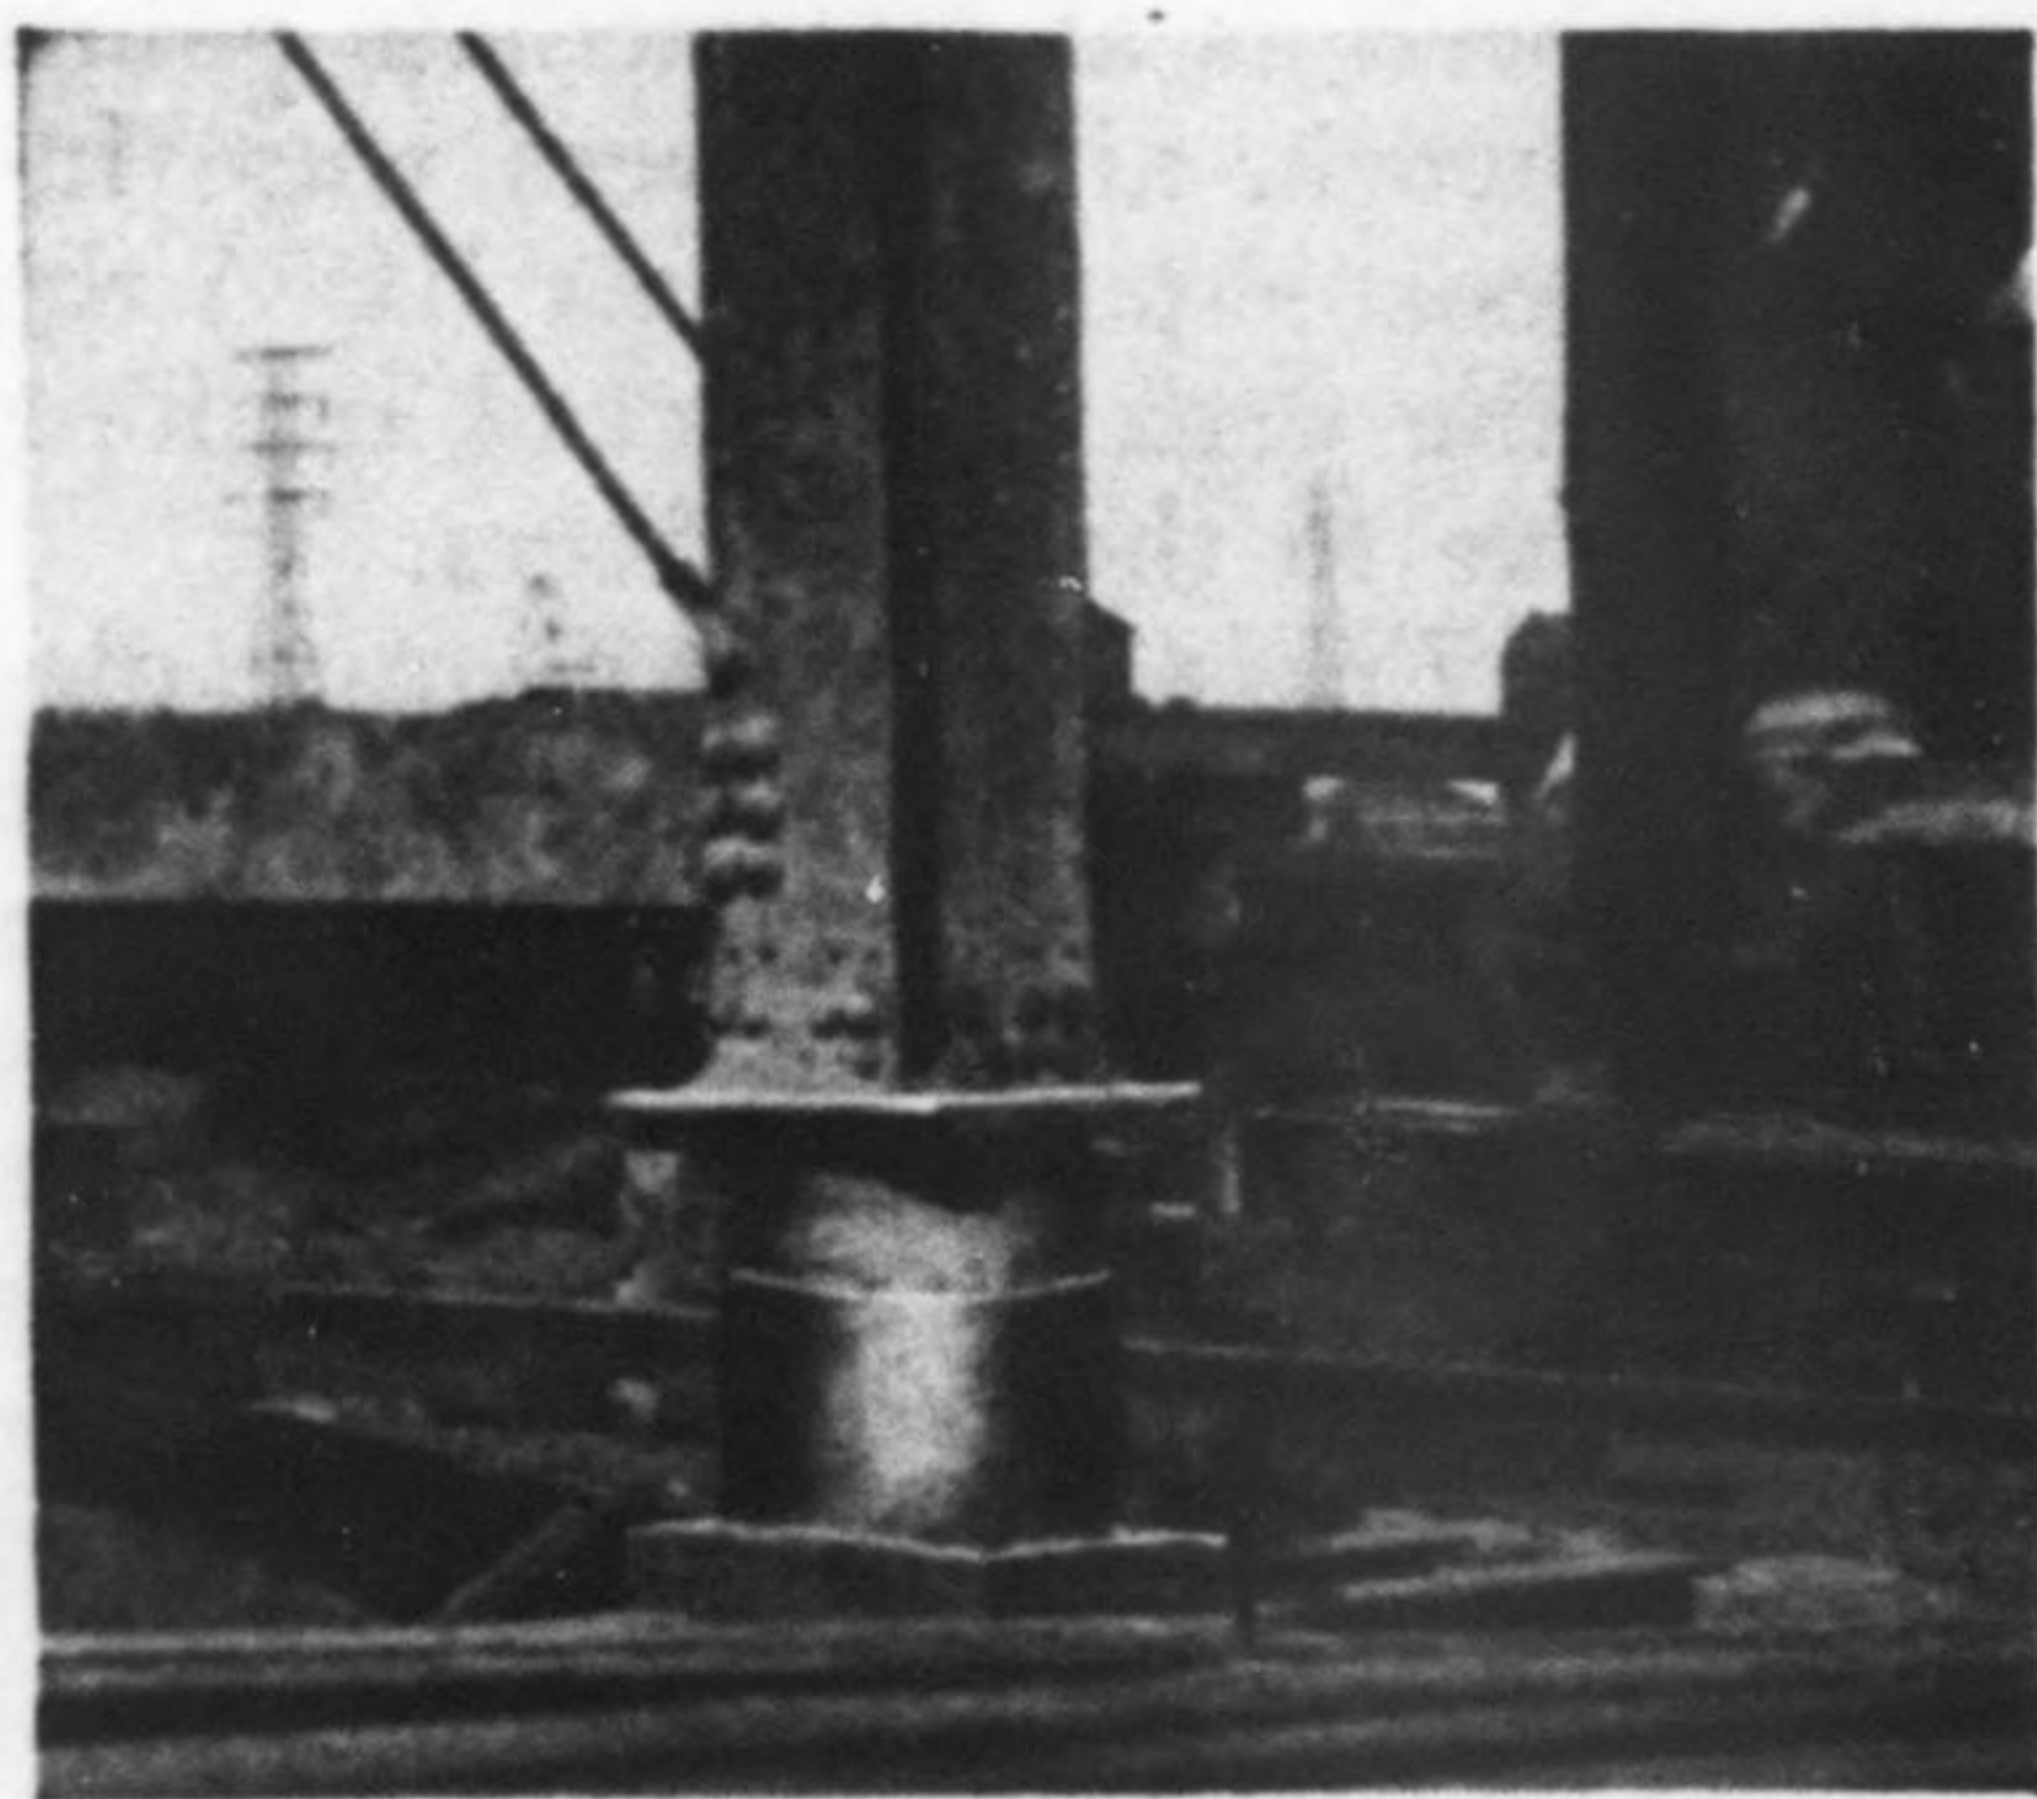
Sand jack used under steel falsework bents on Phoenix Bridge section to adjust span and to swing it free when completed.
